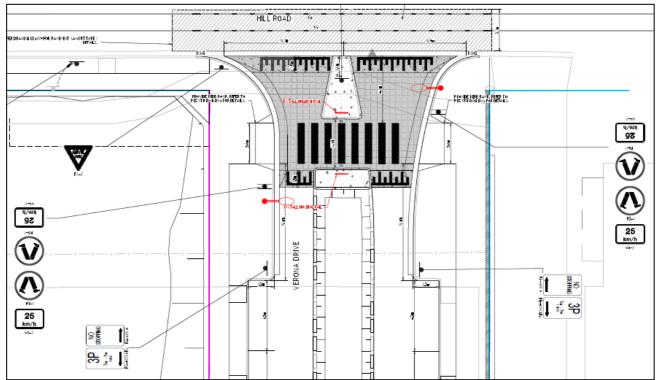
Design of the proposed raised pedestrian crossing in Verona Drive at Hill Road, Wentworth Point
